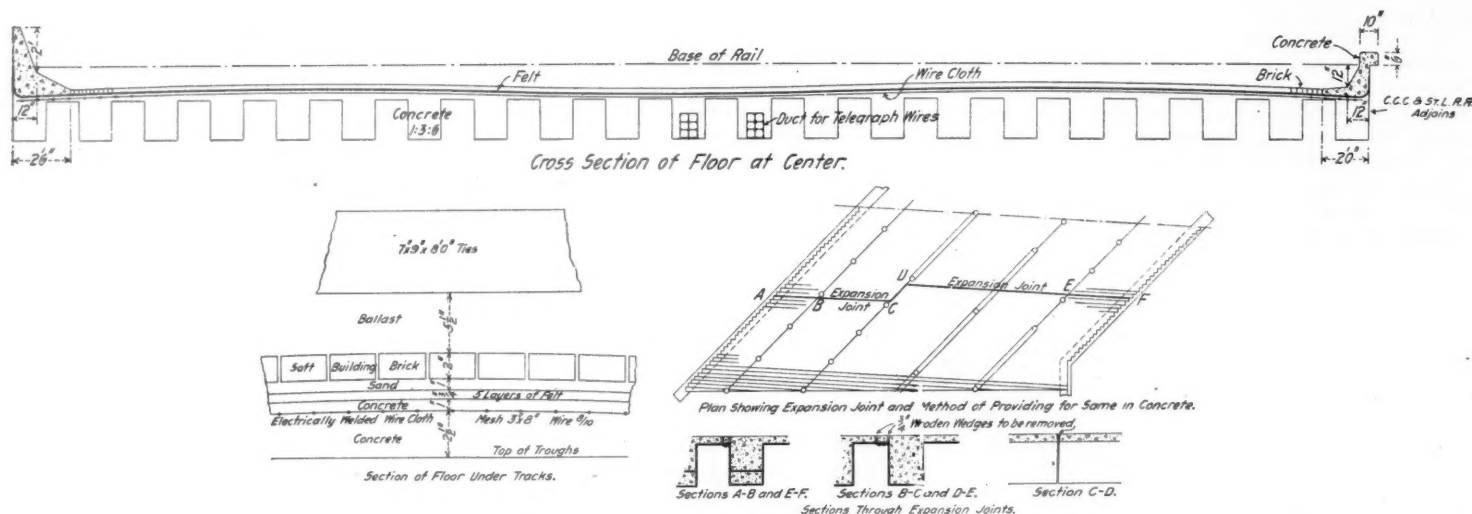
Details of Concrete Floor; Kentucky Avenue Bridge.
